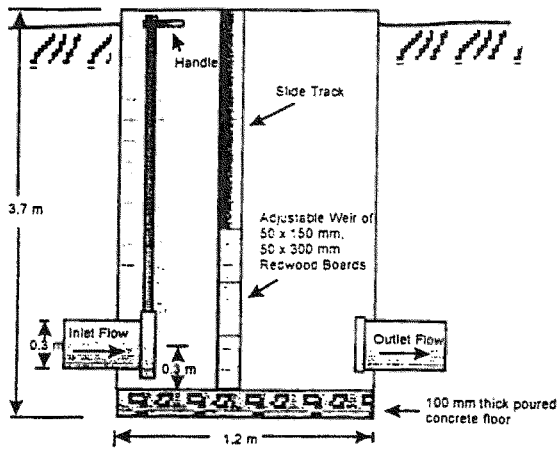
Schematic drawing of manhole and weir structure used on Broadview Shallow Ground Water Management Demonstration Project.
